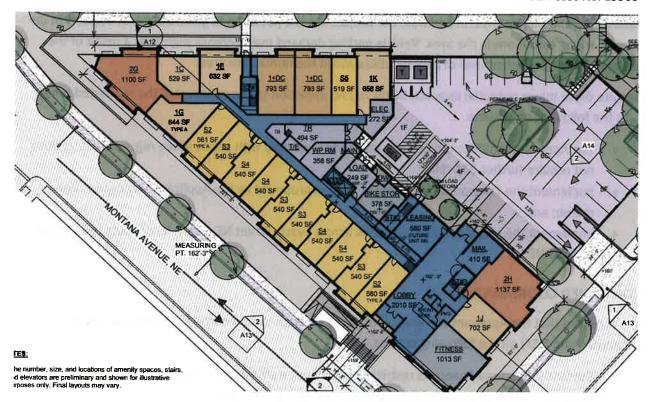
Residential Building Entrance, Source: Exhibit 5 of the BZA Application
